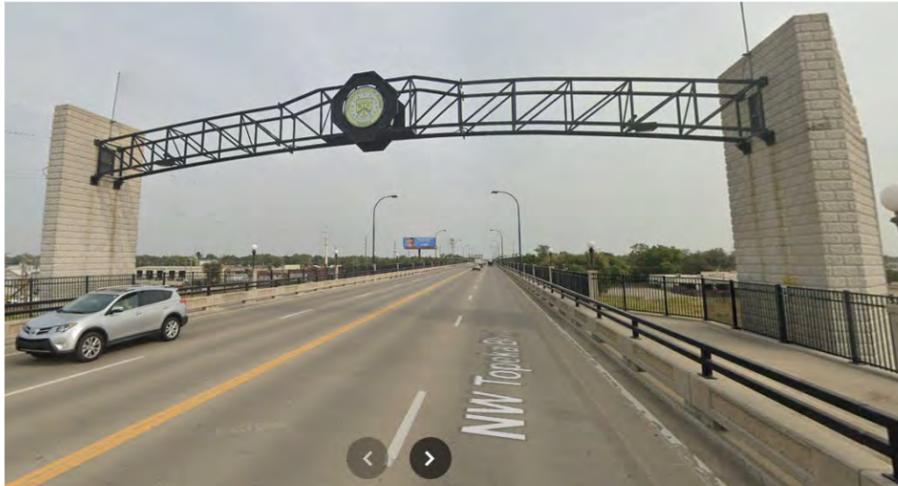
NW Topeka Blvd Bridge Looking North toward North Topeka
